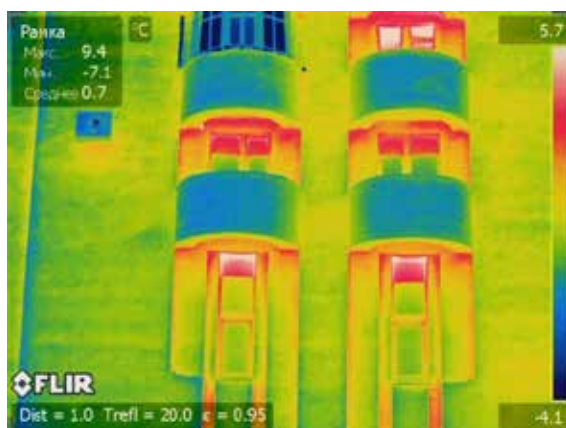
Heat leakage through the joints of walls and improperly designed balcony slabs
